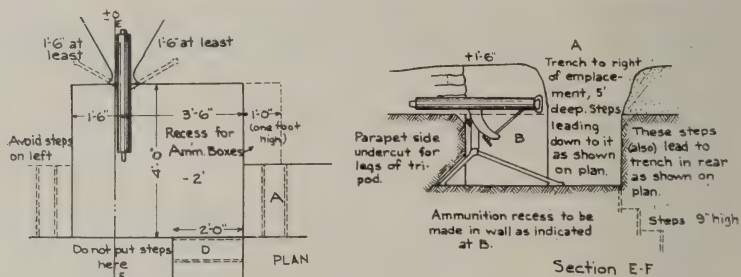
Machine-gun emplacement. (From P. 53 "Knowledge for War."—Capt. Lake, 1916.)
